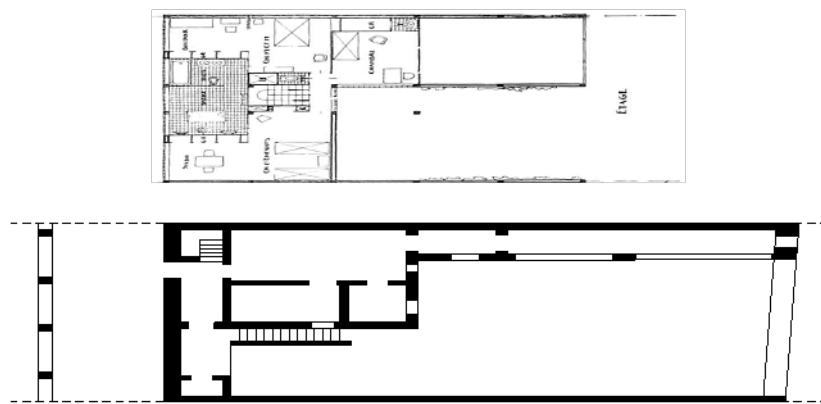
Plan of the Erna Valley Charterhouse cell and plan of the Immeuble-villas apartment
